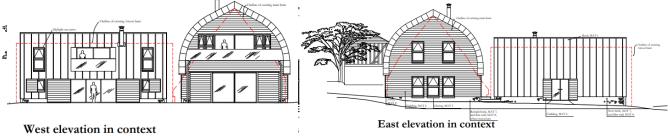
Proposed elevations of Barn and Annexe (not to scale)
